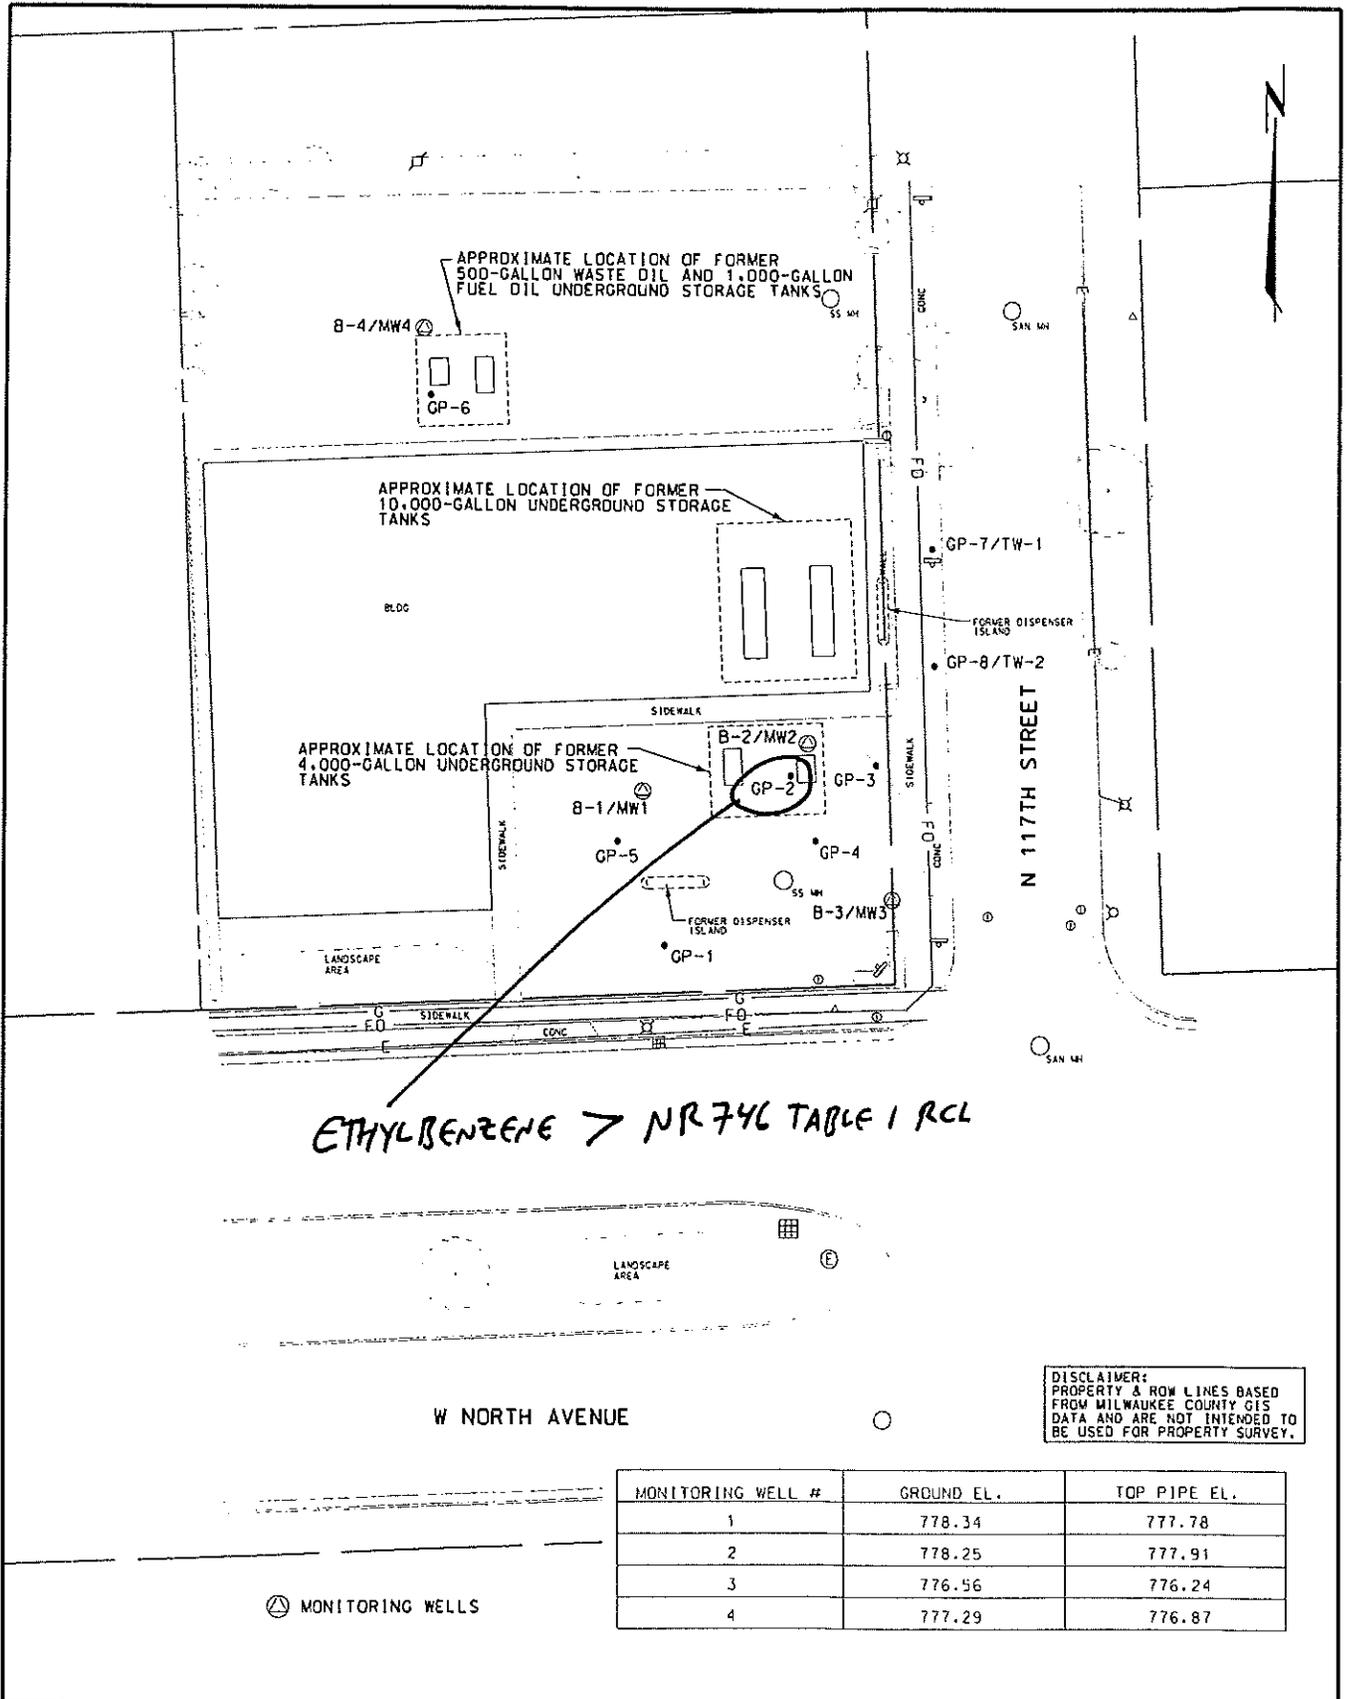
β SITE LAYOUT WITH MONITORING WELL AND SOIL BORING LOCATIONS
